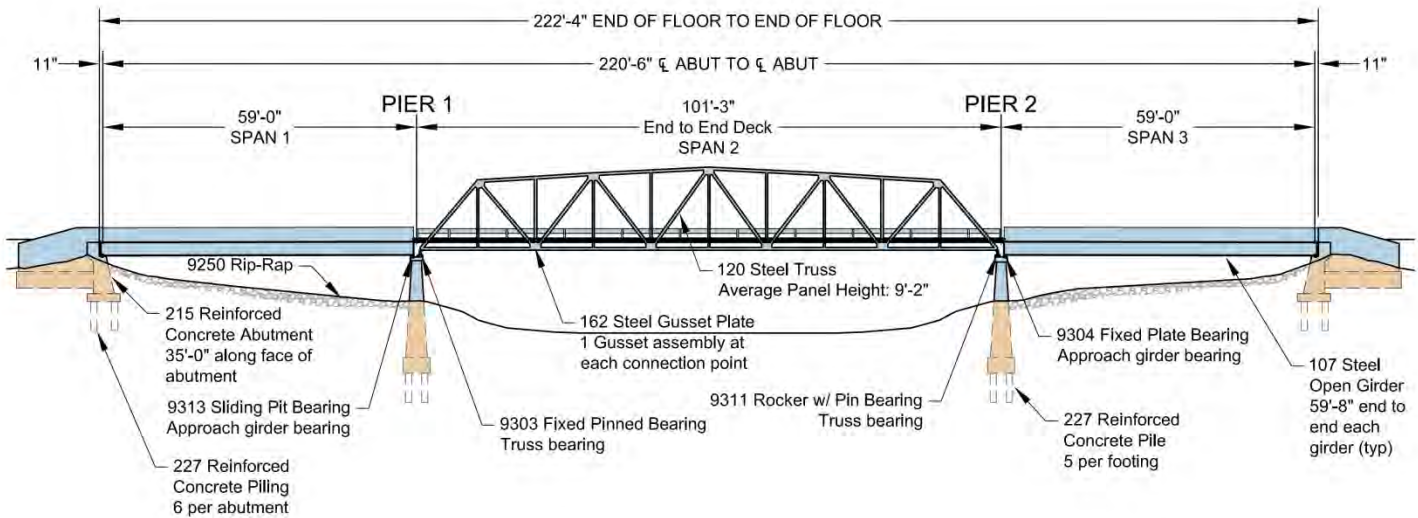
EI.24.10- 1: Elevation view of steel truss bridge
